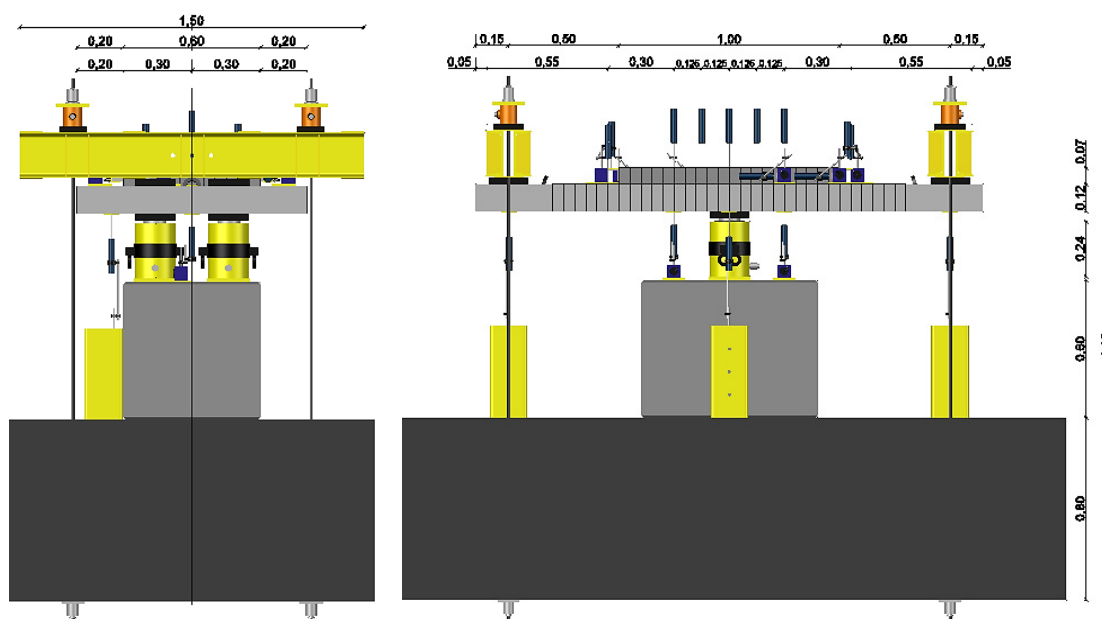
Dimensions (front and side view) of  $R_s$  test layout.
